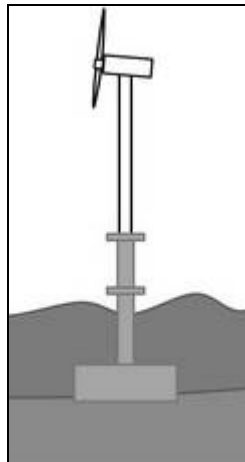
Structure of a gravity foundation (OFFFSHORE-WIND, 2010)
